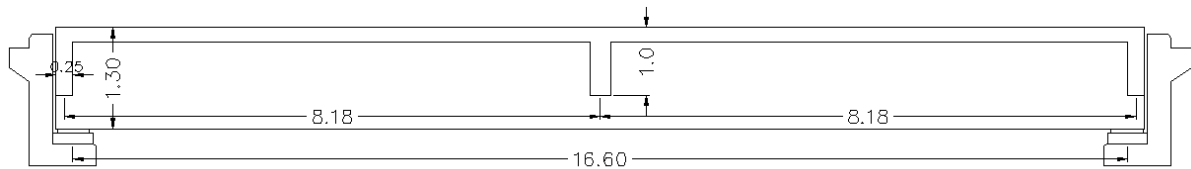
Elevation view for the proposed bridge (Dimensions are in meters)
